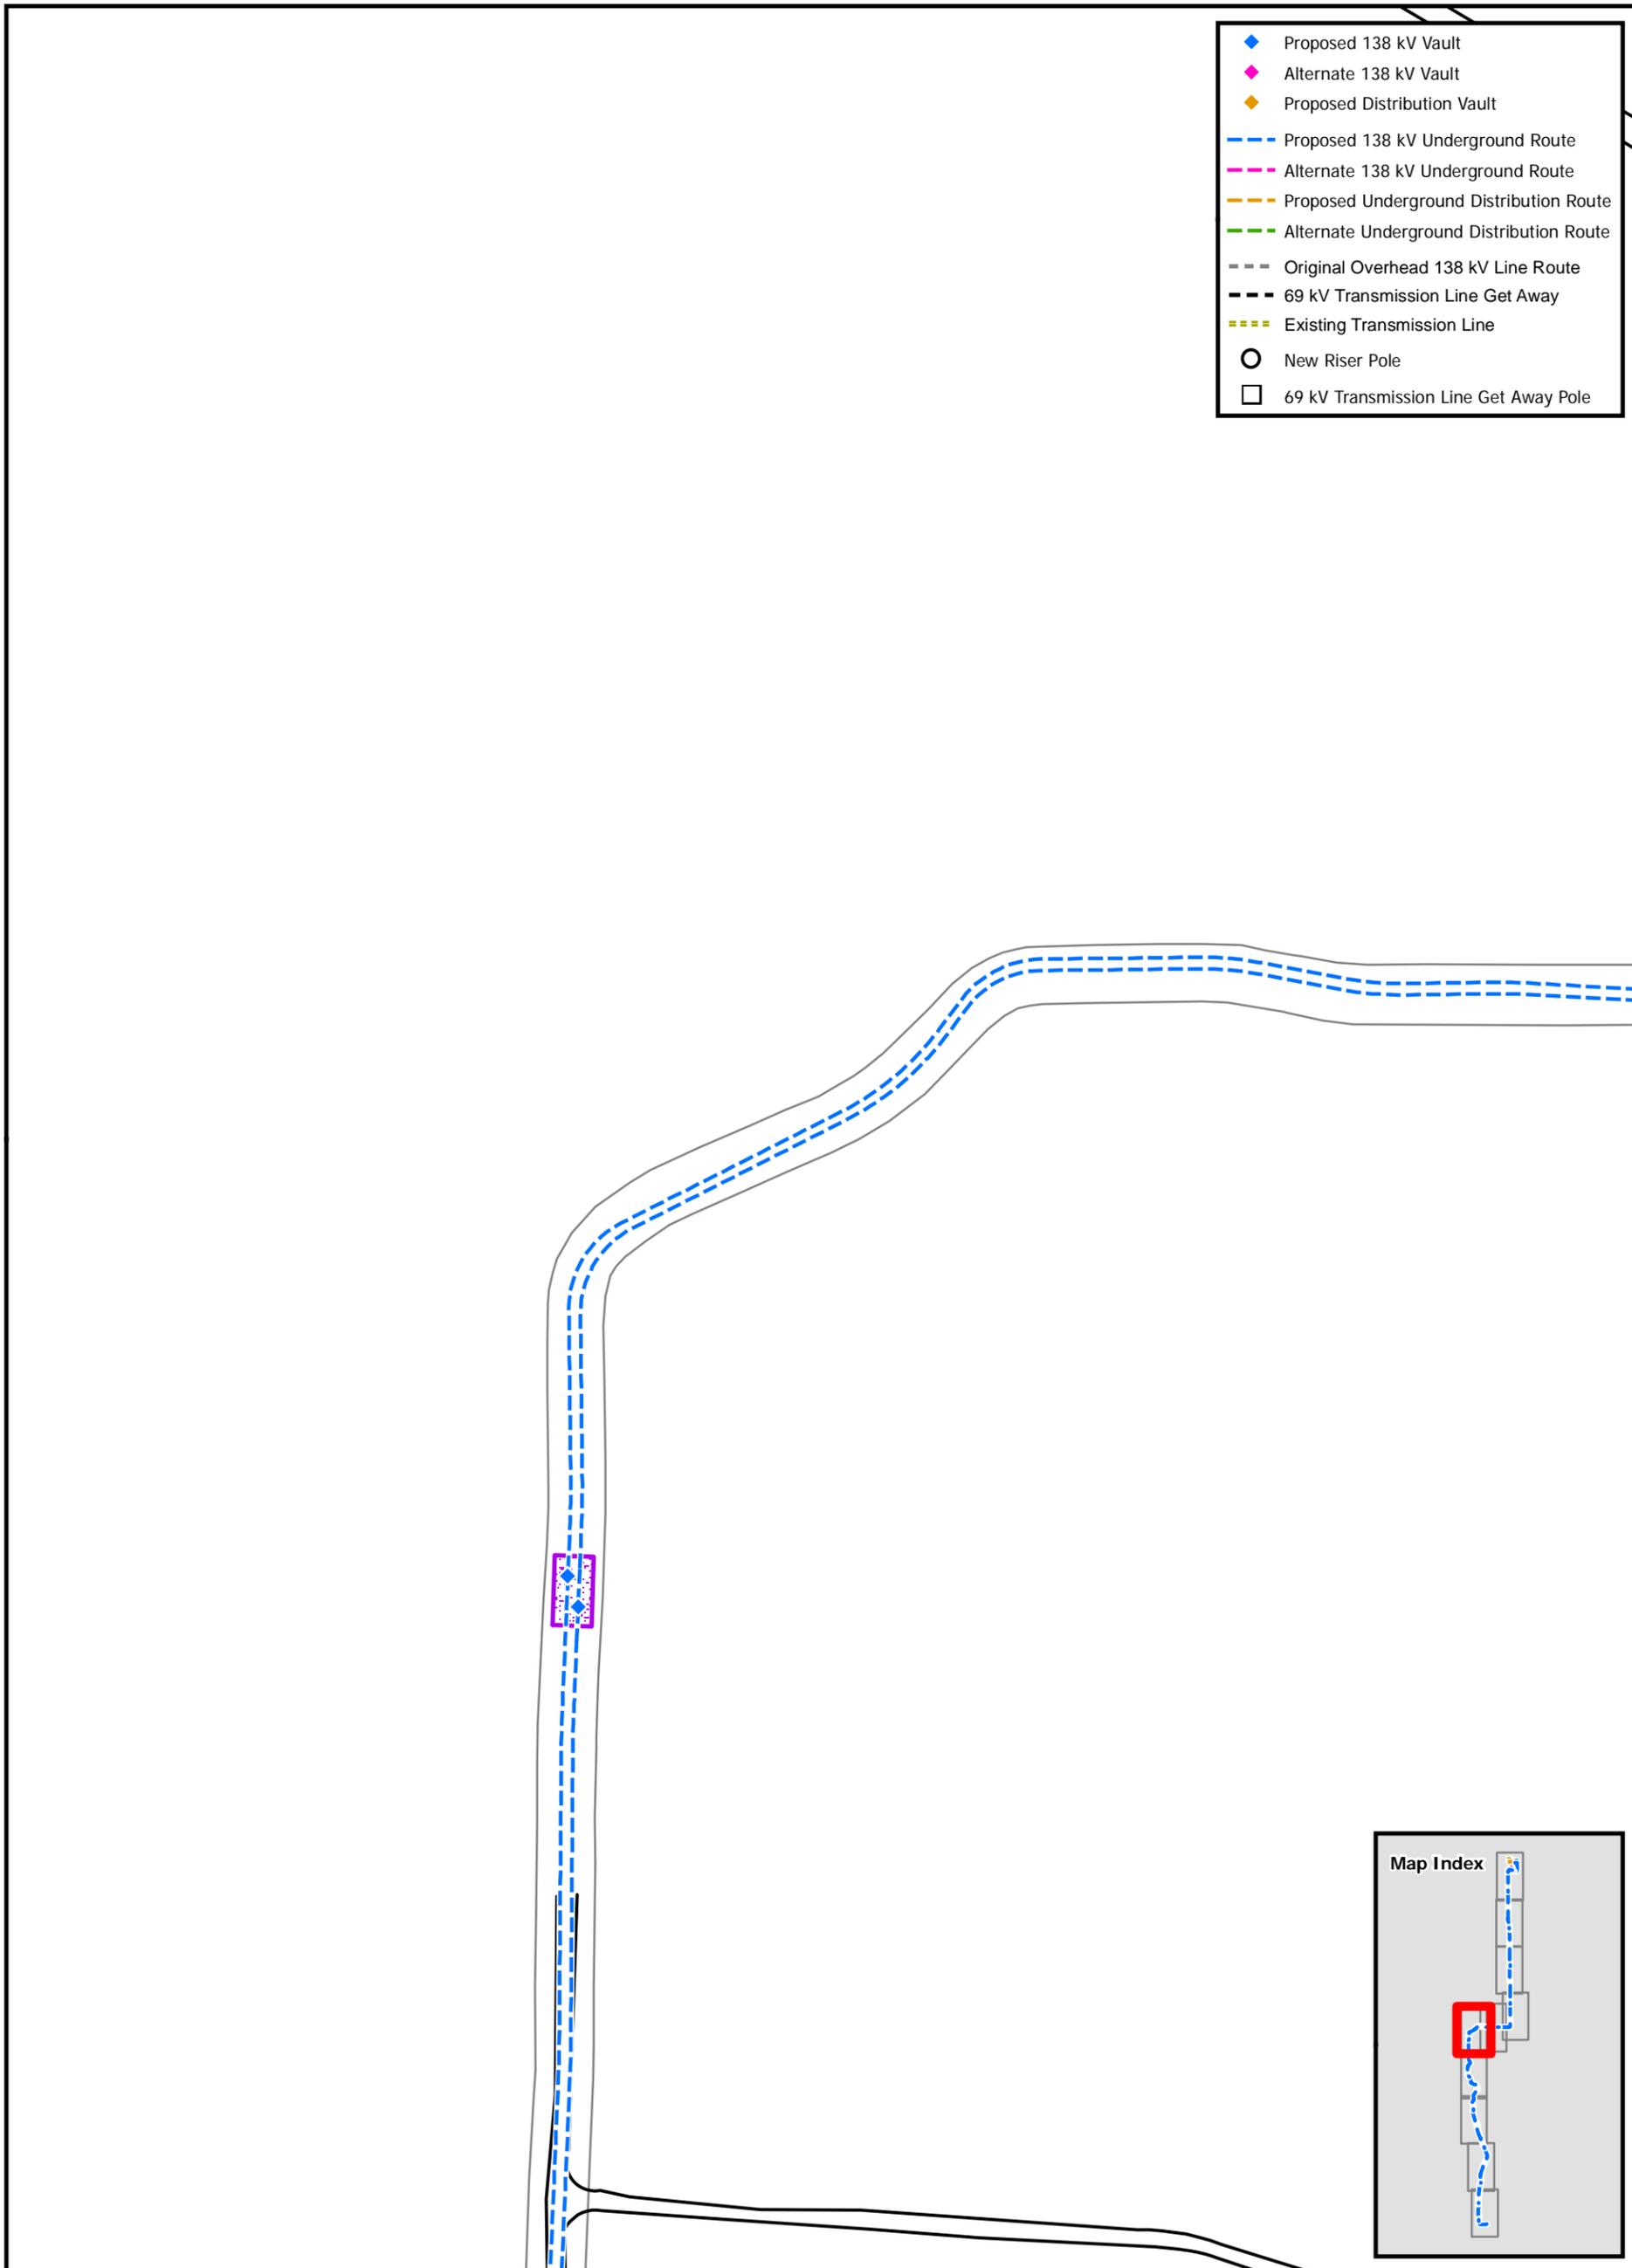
Preliminary Underground Alignment Drawing 6 of 10
